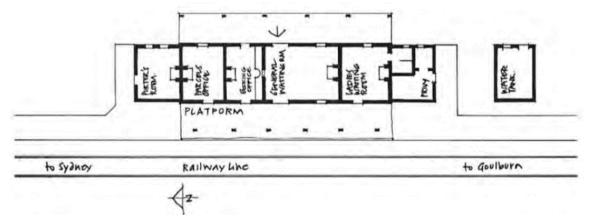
The original Moss Vale Railway Station, built in 1867, showing entrance to waiting room and booking office from the East Side (Peter Freeman, 1998 in OCP Architects 2020a:16)
